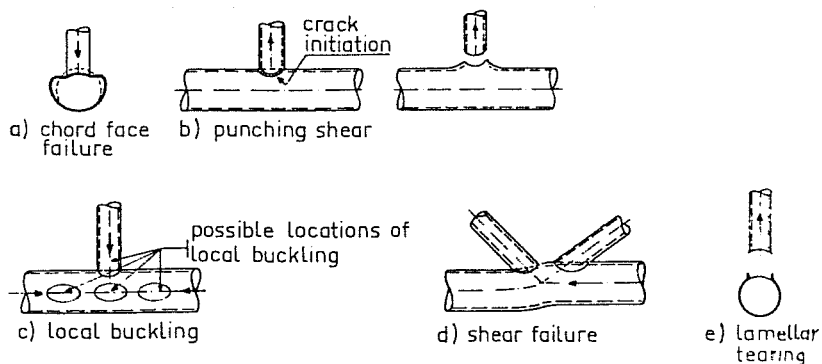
Typical Modes of Failure for Branch Axial Loads
